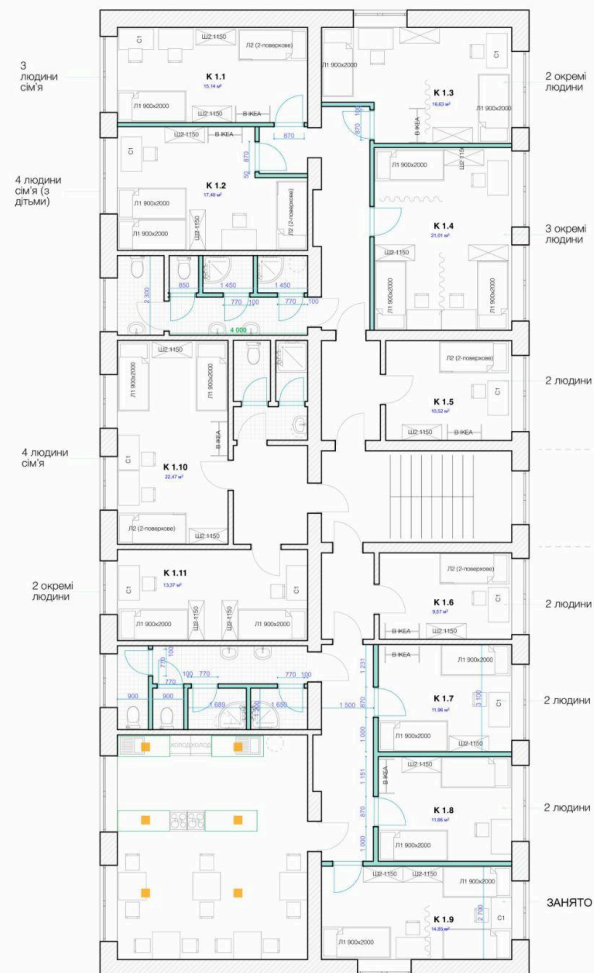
Sadok – Section 1, 2nd Floor Plan
